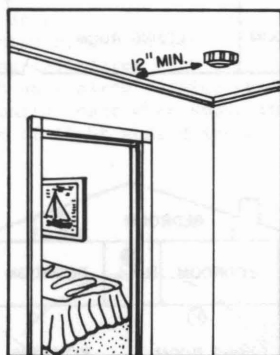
Mount ceiling detector units at least 12 inches from walls.
